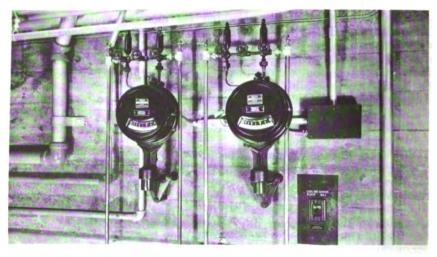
Orifice type flowmeters in cooling water supply to generator air coolers and generator bearing oil coolers—Guntersville.
